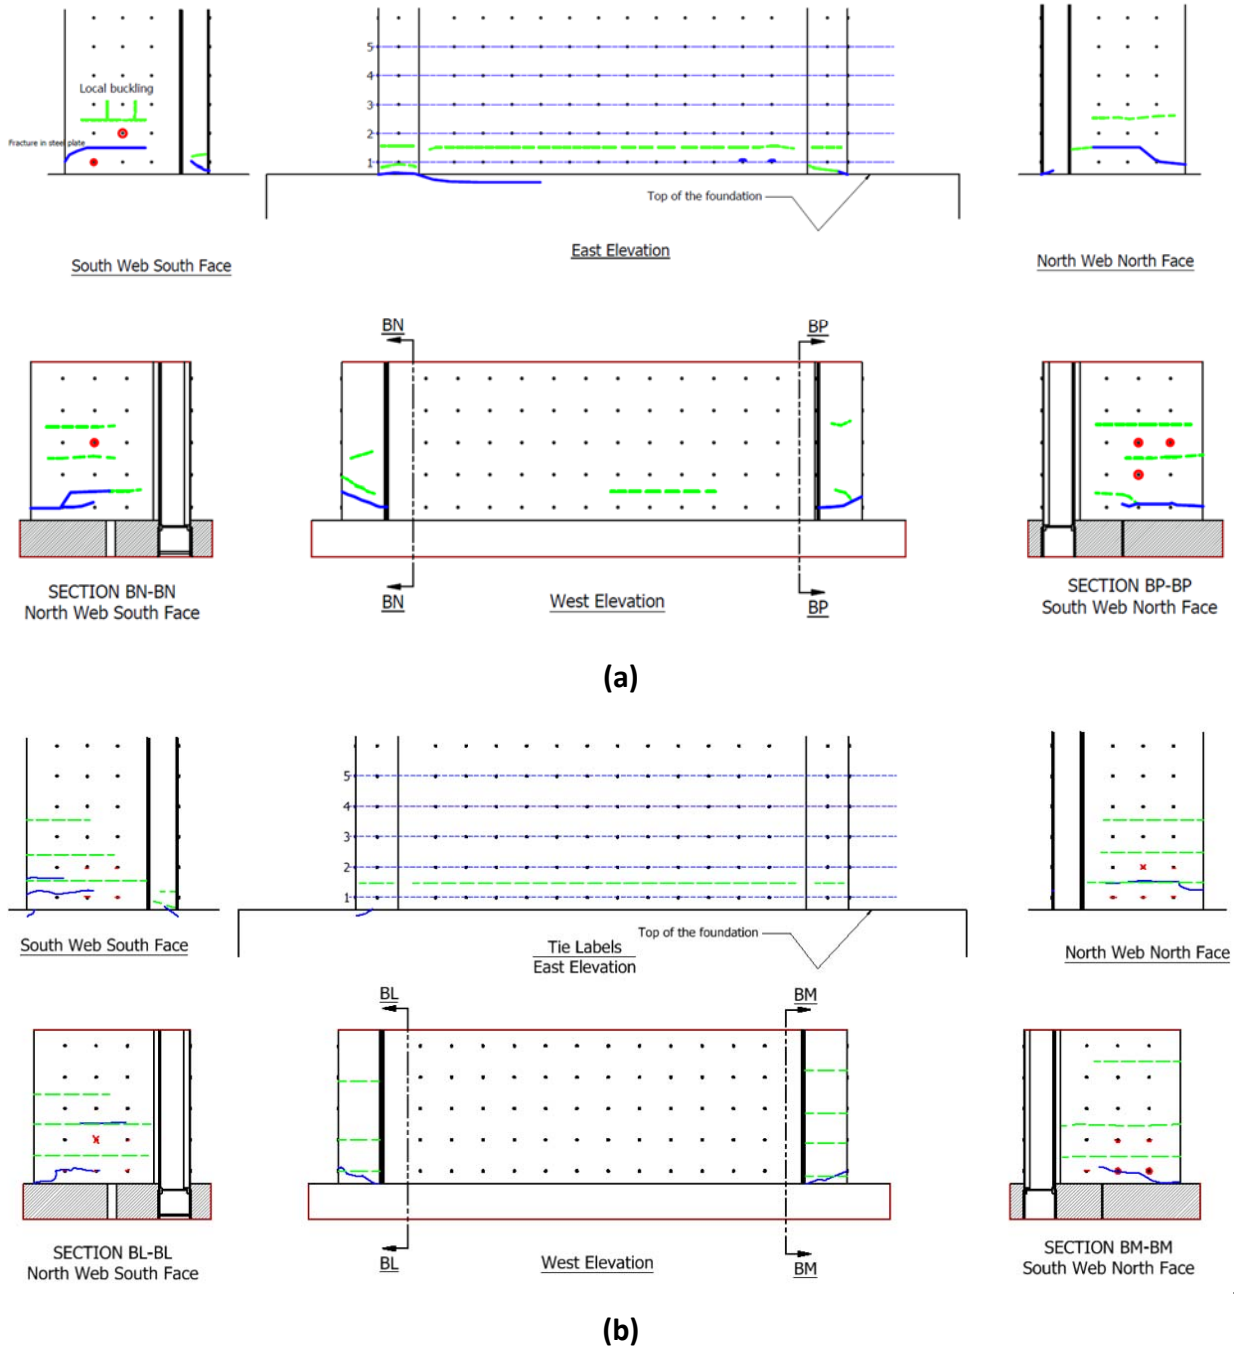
Post-test damage inspection of the wall steel plates for: (a) Specimen C1, and; (b) Specimen C2
